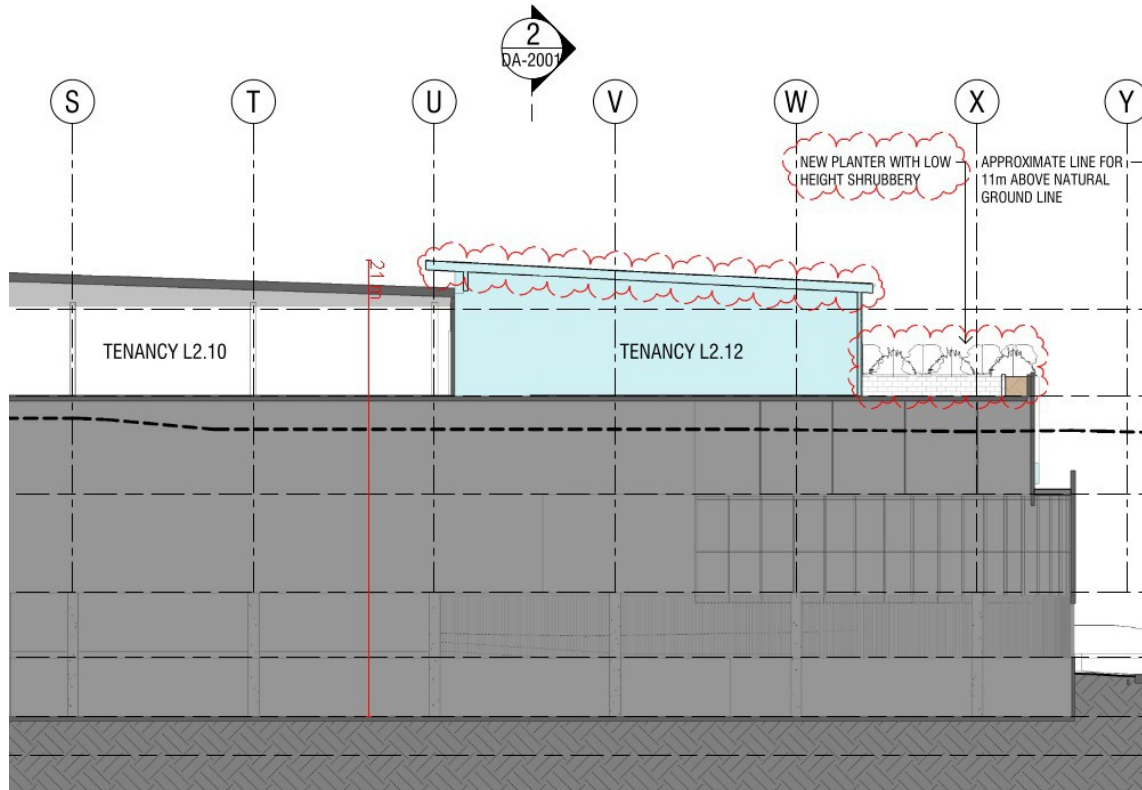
Part Section 1 with 21.0m maximum roof height annotation (Drawing DA-2001 prepared by Buchan Group).
